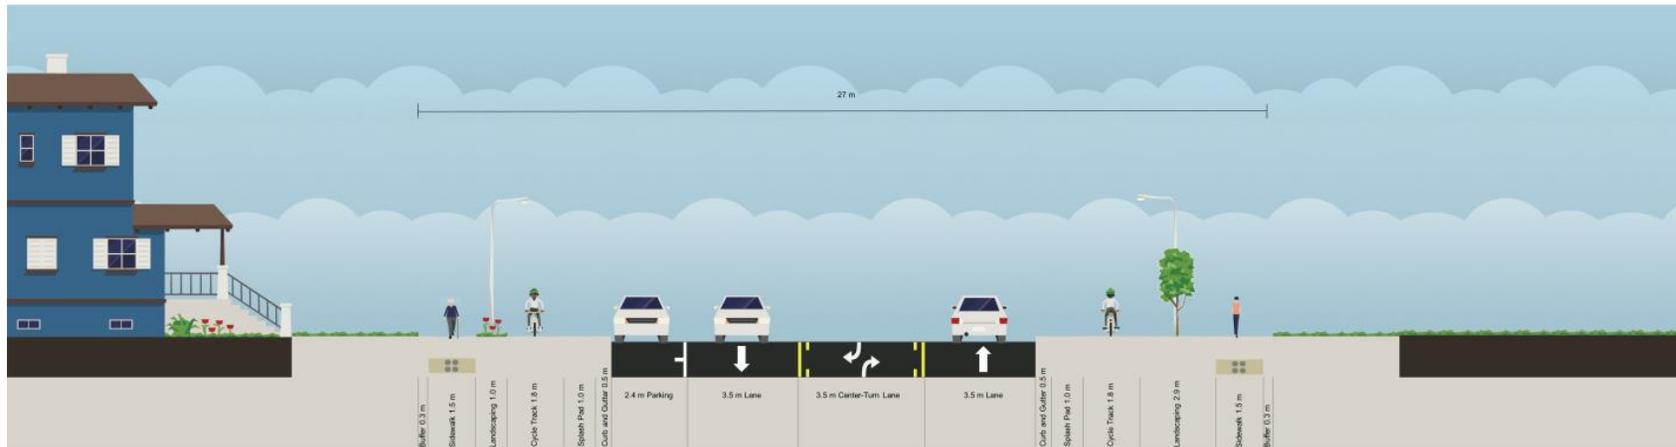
Area 4 Preferred Typical Cross-Section
